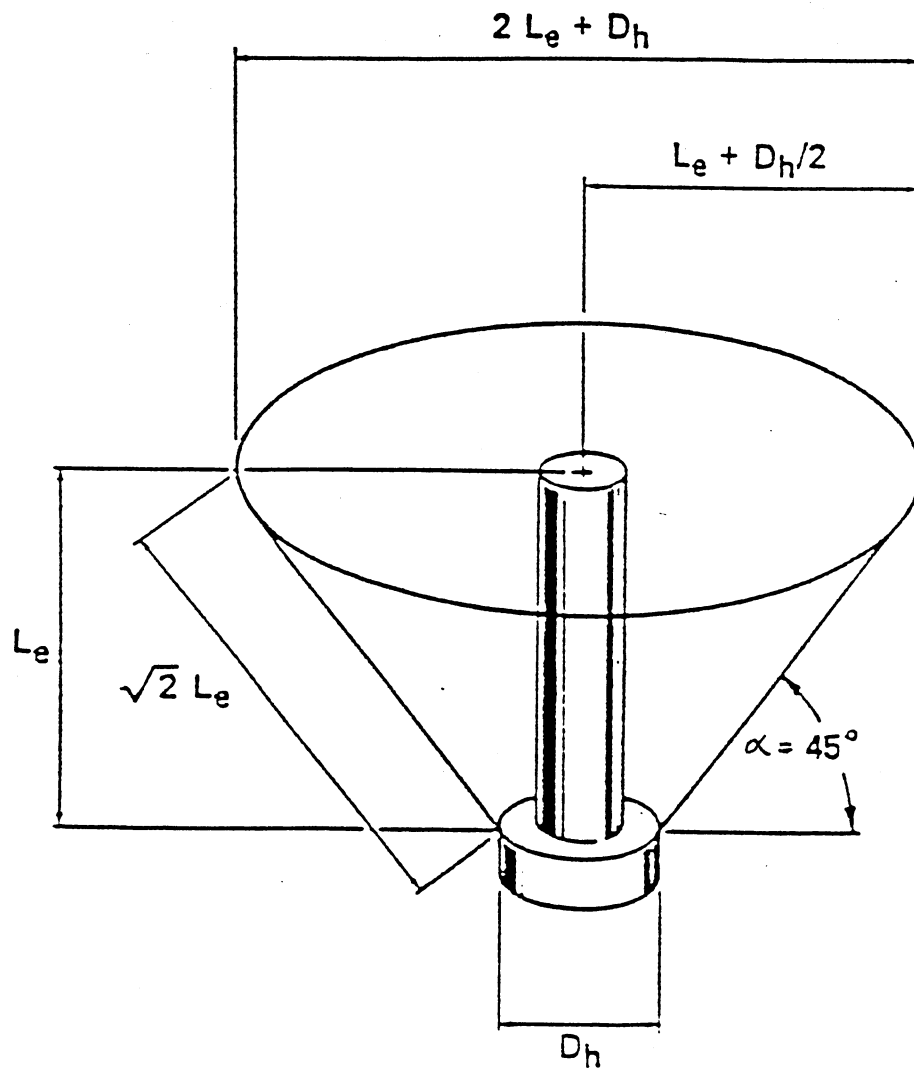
Pullout Failure for Concrete Loaded in Tension (8)
